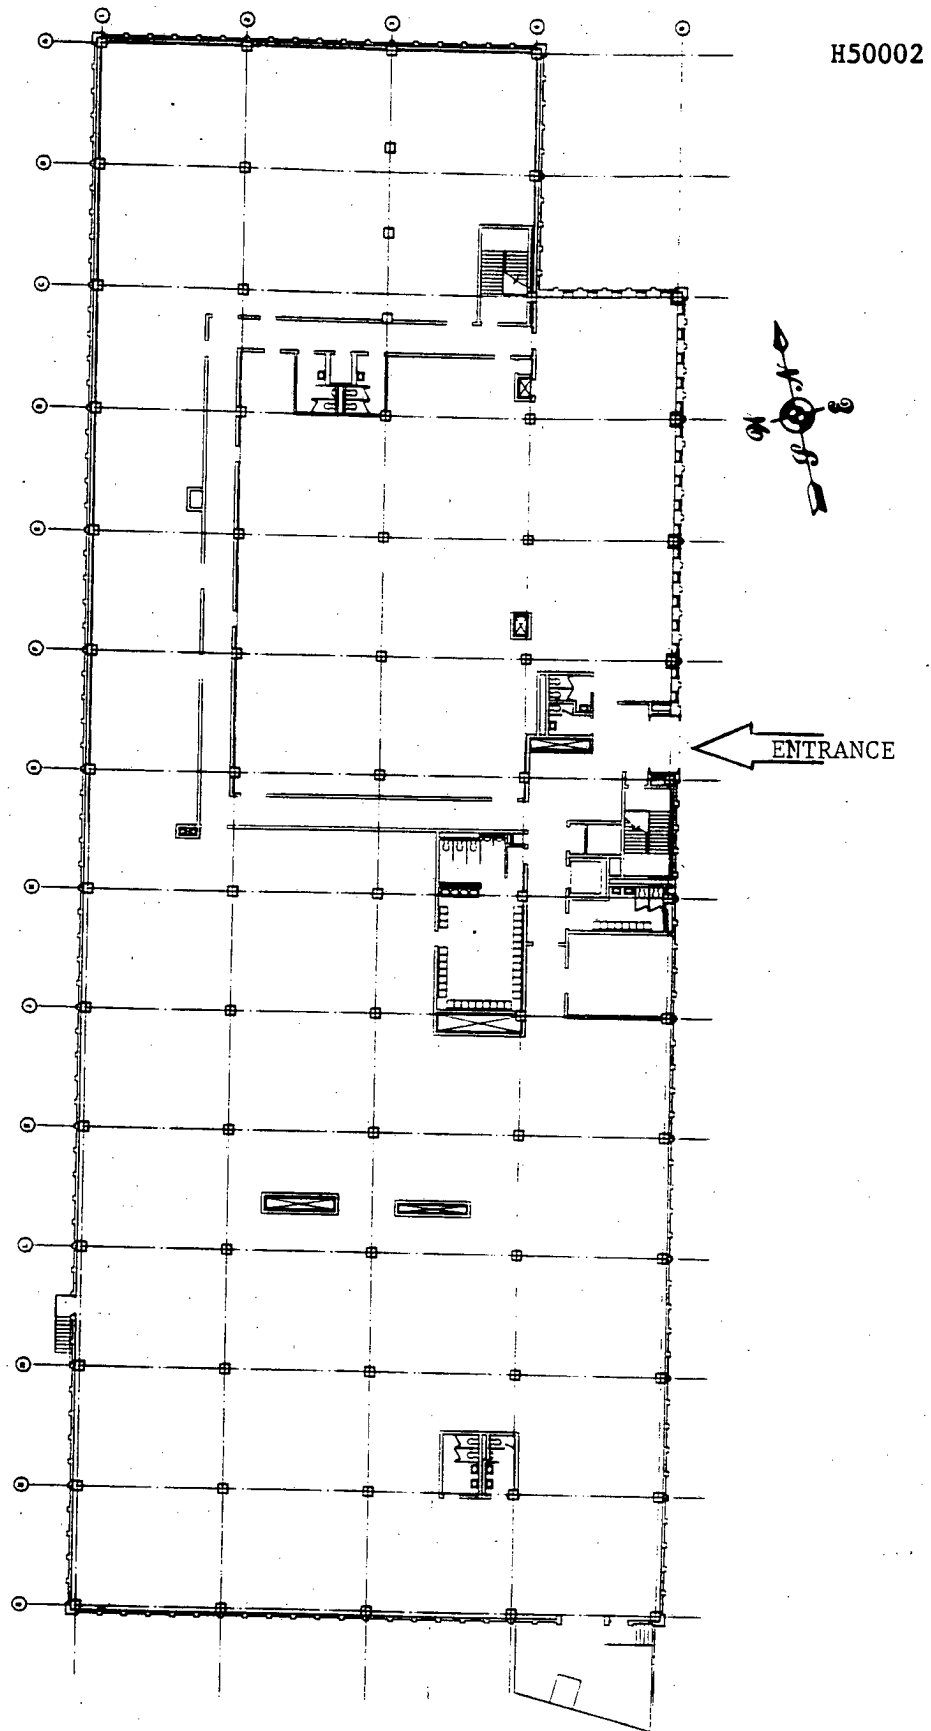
FIRST FLOOR P&PD BUILDING FLOOR PLAN
